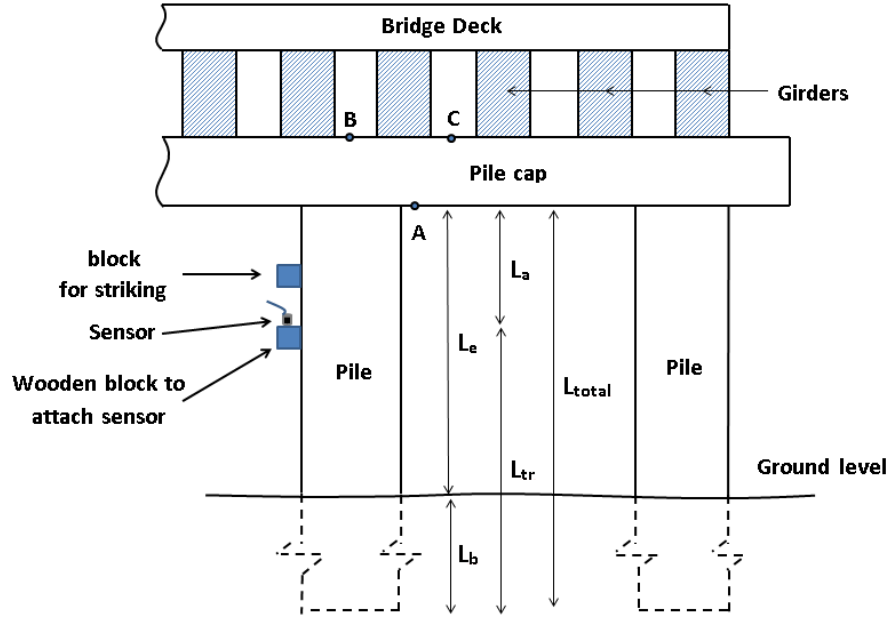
SE/IR Test Setup for Piles Underneath a Bridge
